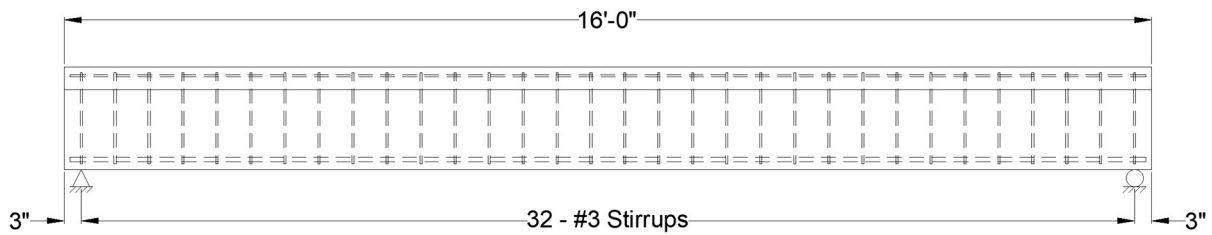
Shear Reinforcement and Support Locations for Final Beam Design
